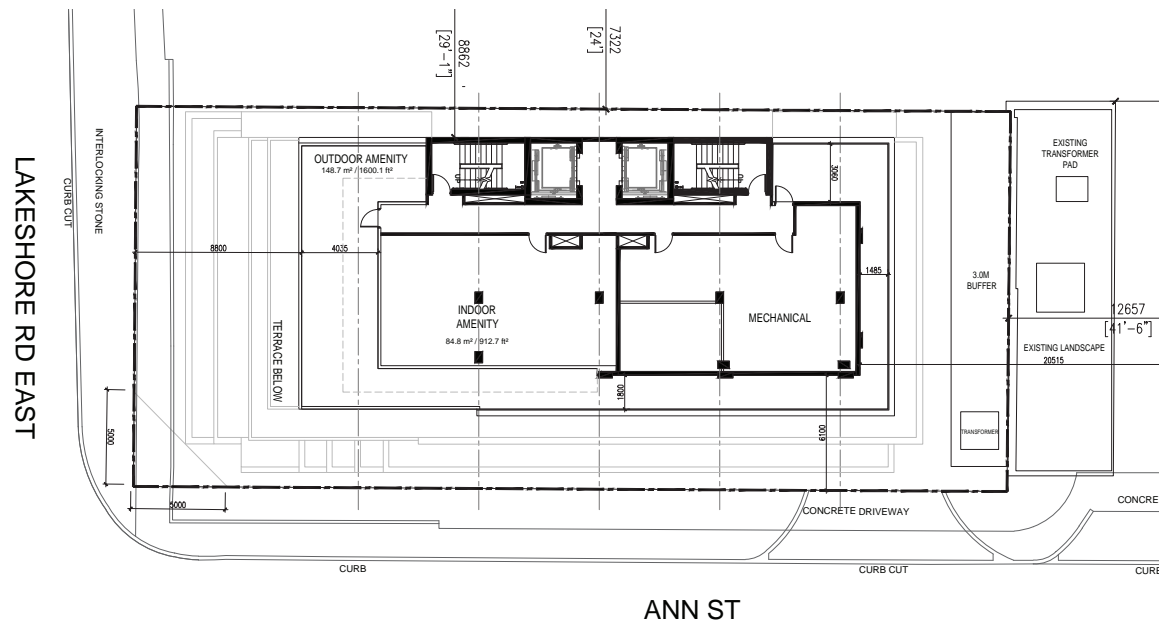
Penthouse Level Plan showing the outdoor and indoor amenity spaces as well as the terraces on the floors below
